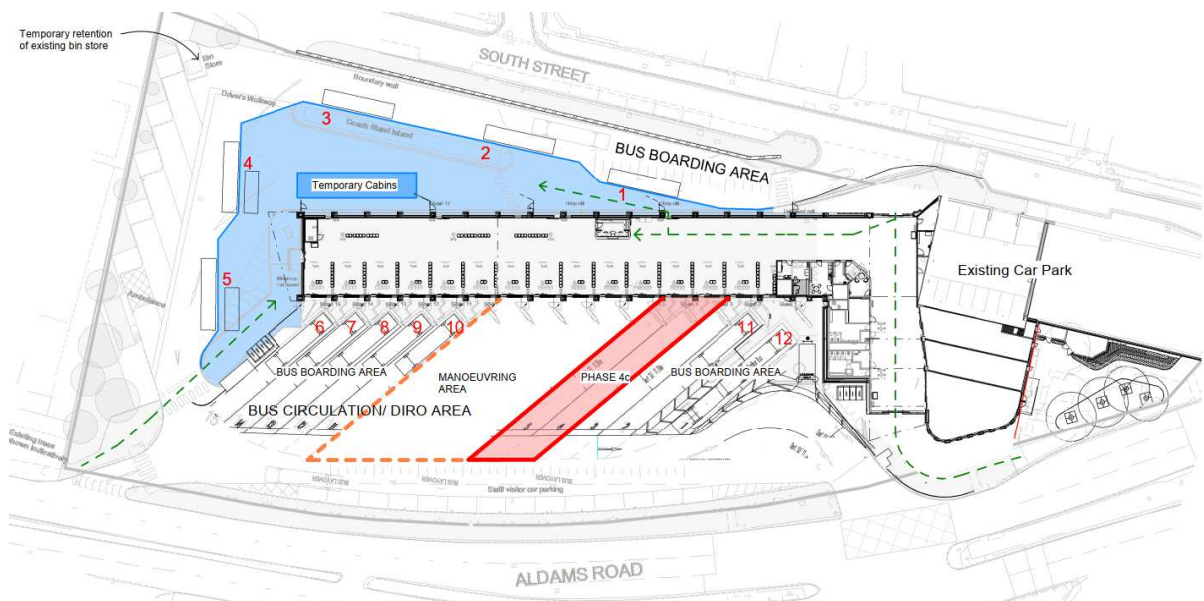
Phase 4c Plan – External Works to DIRO Bays
